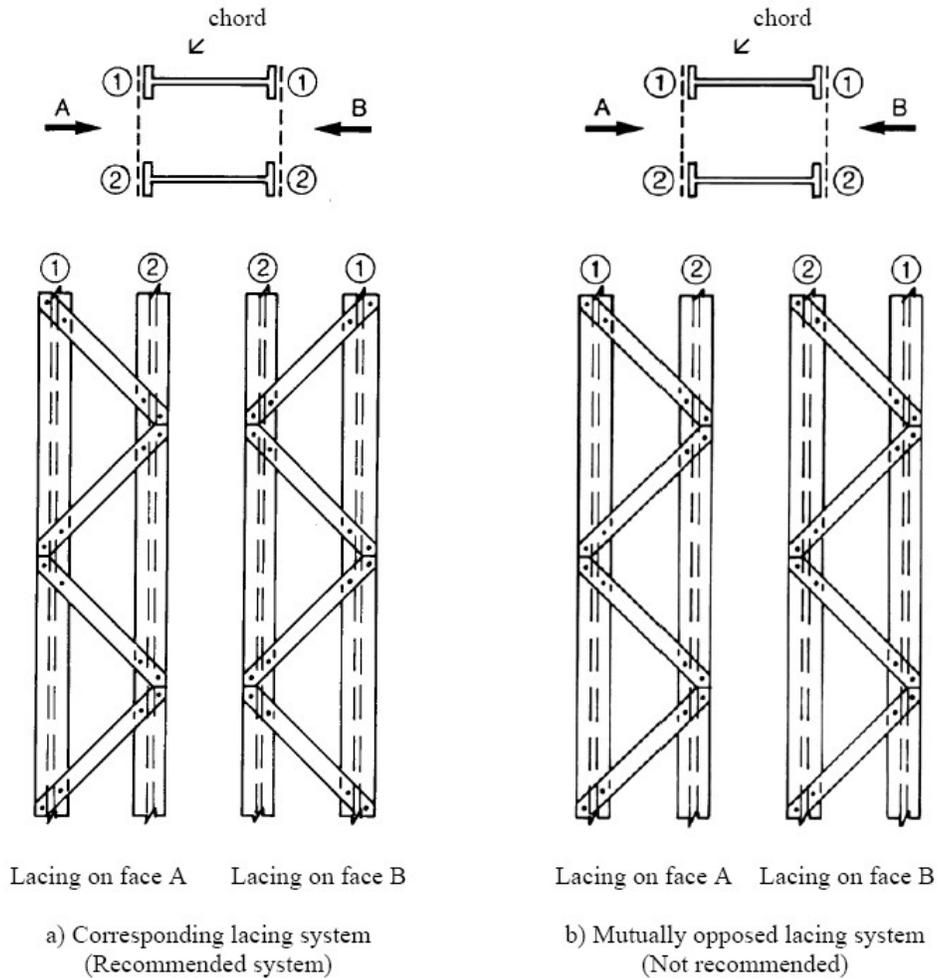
Single lacing system on opposite faces of a built-up member with two parallel laced planes
